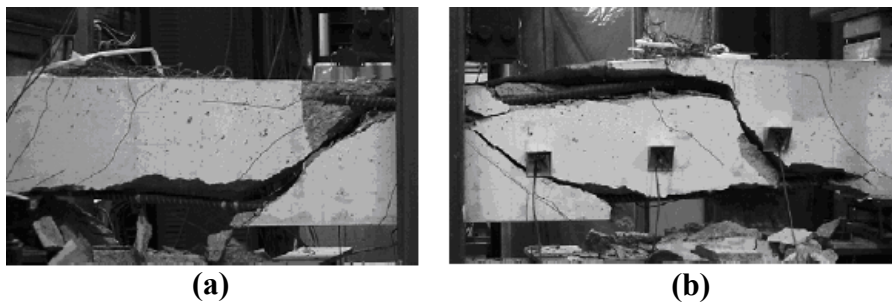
View of Beam SS0b-1 after Test: (a) North Half; (b) South Half
